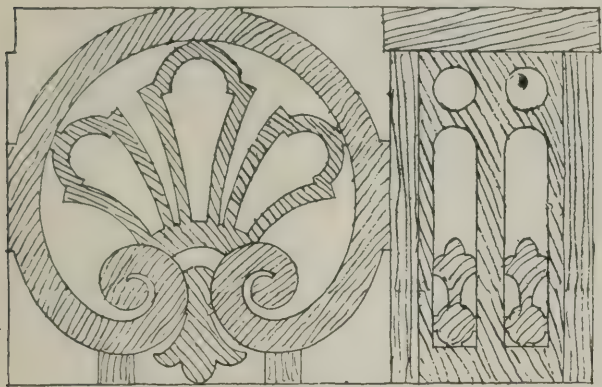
DETAIL OF JIG-SAW WORK IN FRIEZE OF FIG. 1.
